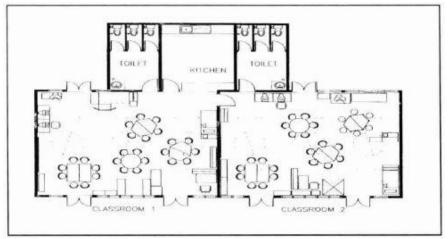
Example of layout floor-plan renovated existing public preschool classroom
